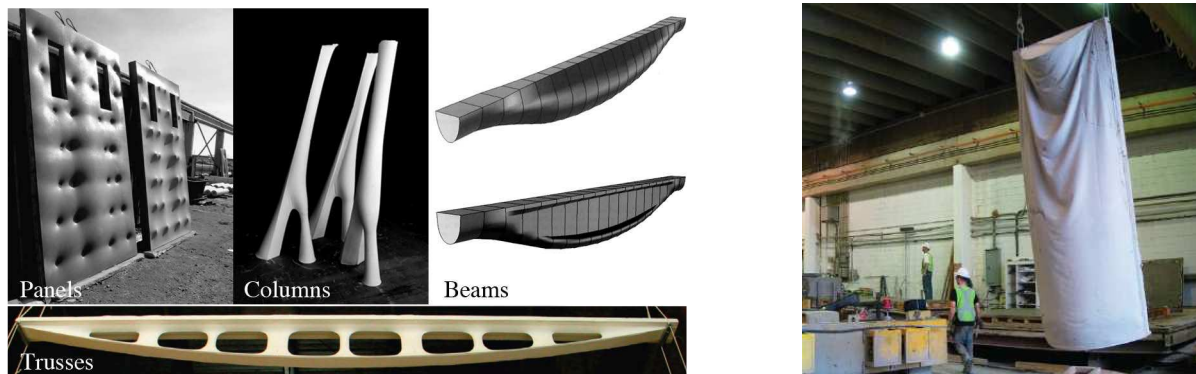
Fabric formed structures (after West [7]; Garbett [8])
